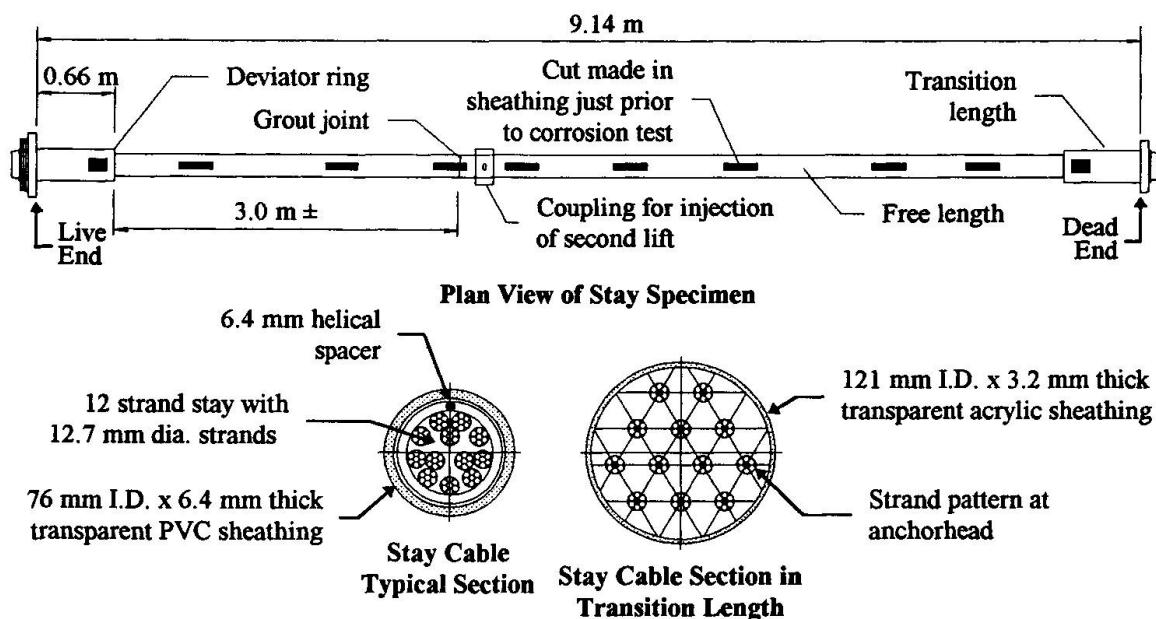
Details of Large Scale Stay Cable Specimens.
